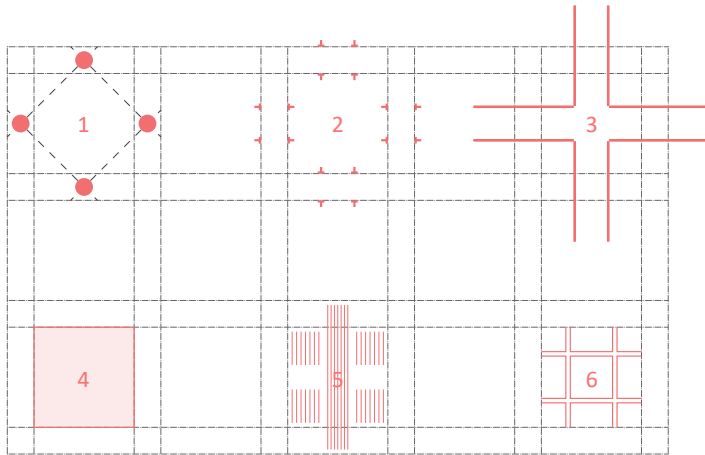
structure system of the module : 1. underground column, 2. column, 3. beam, 4. floor, 5. wiring, 6. ceiling(J.Lim, 2017)
